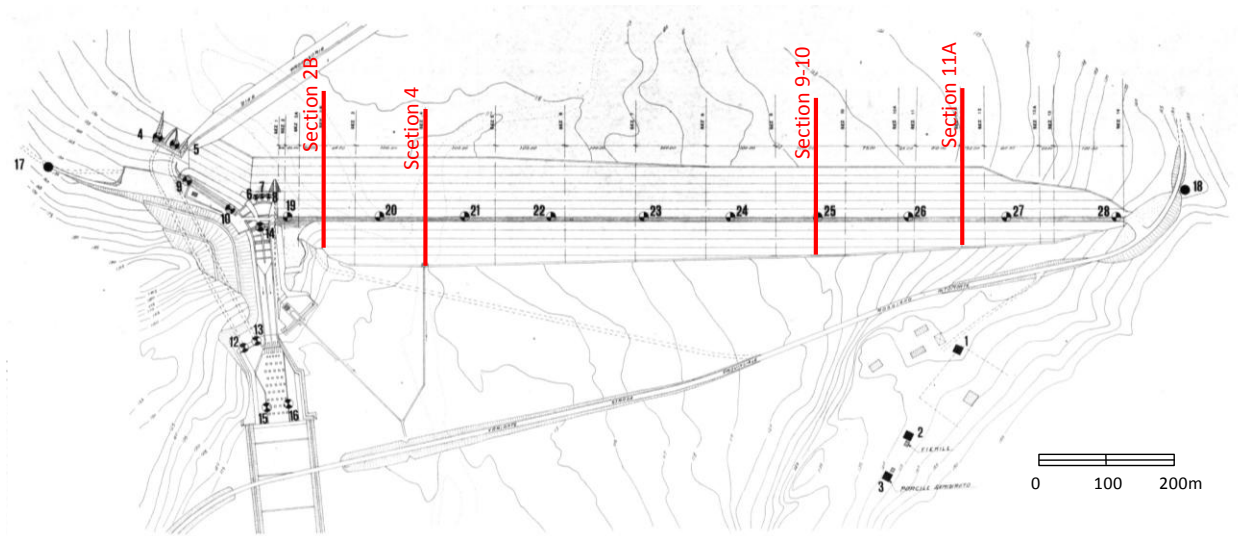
Planimetric view of the four instrumented cross section of the Farneto del Principe dam (2B, 4, 9-10 and 11A).
